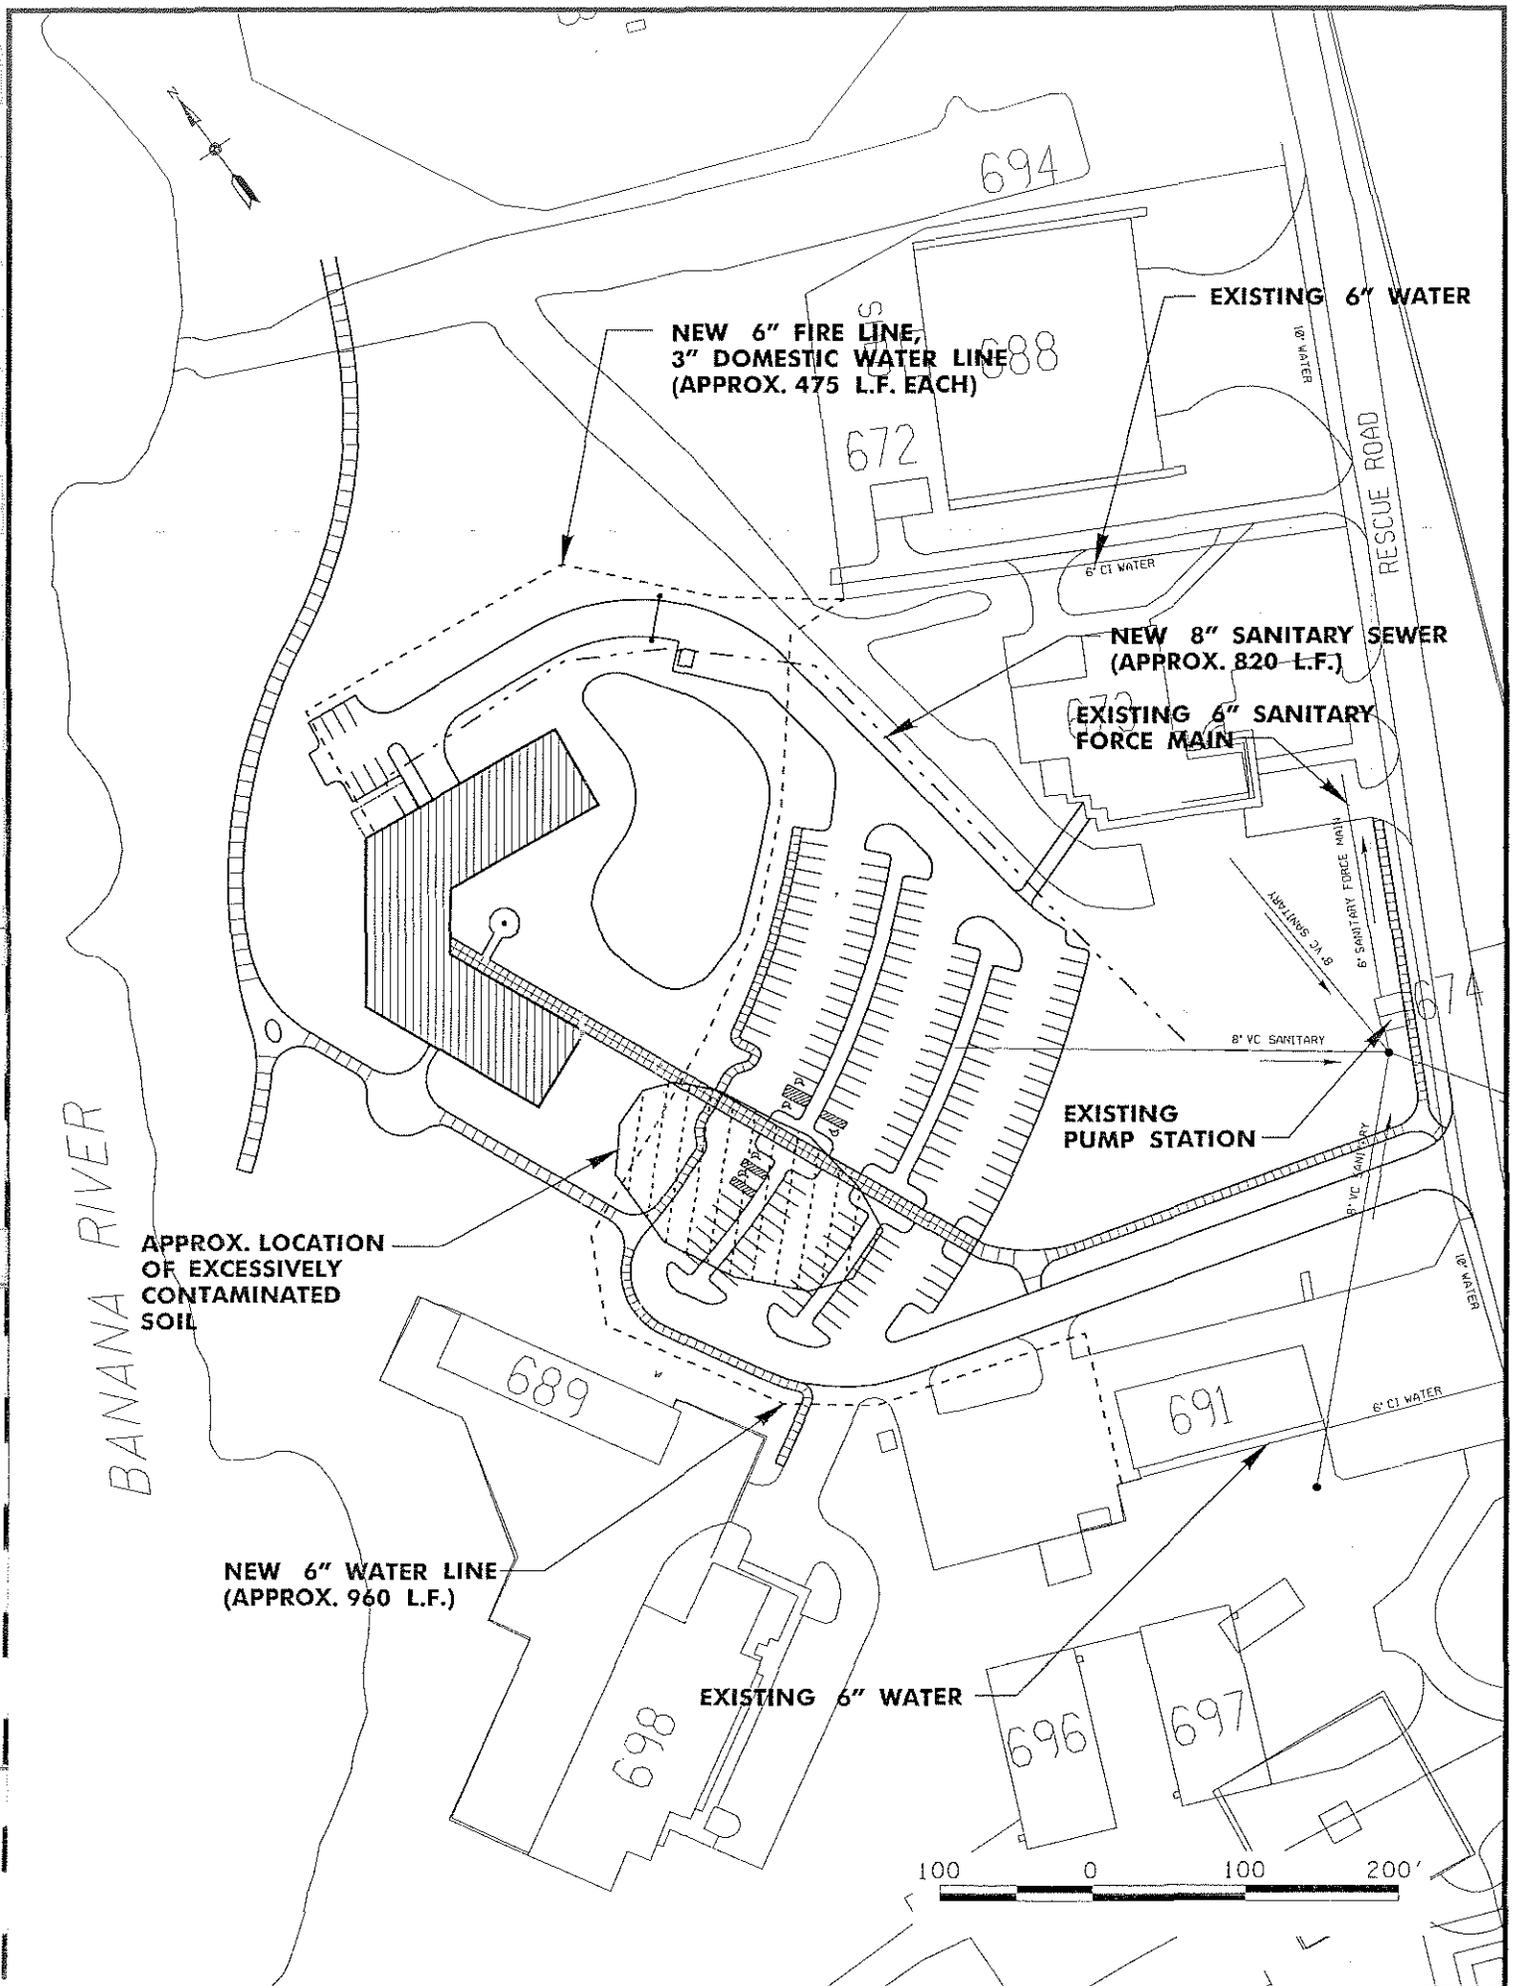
PROPOSED WING HEADQUARTERS UTILITY PLAN
